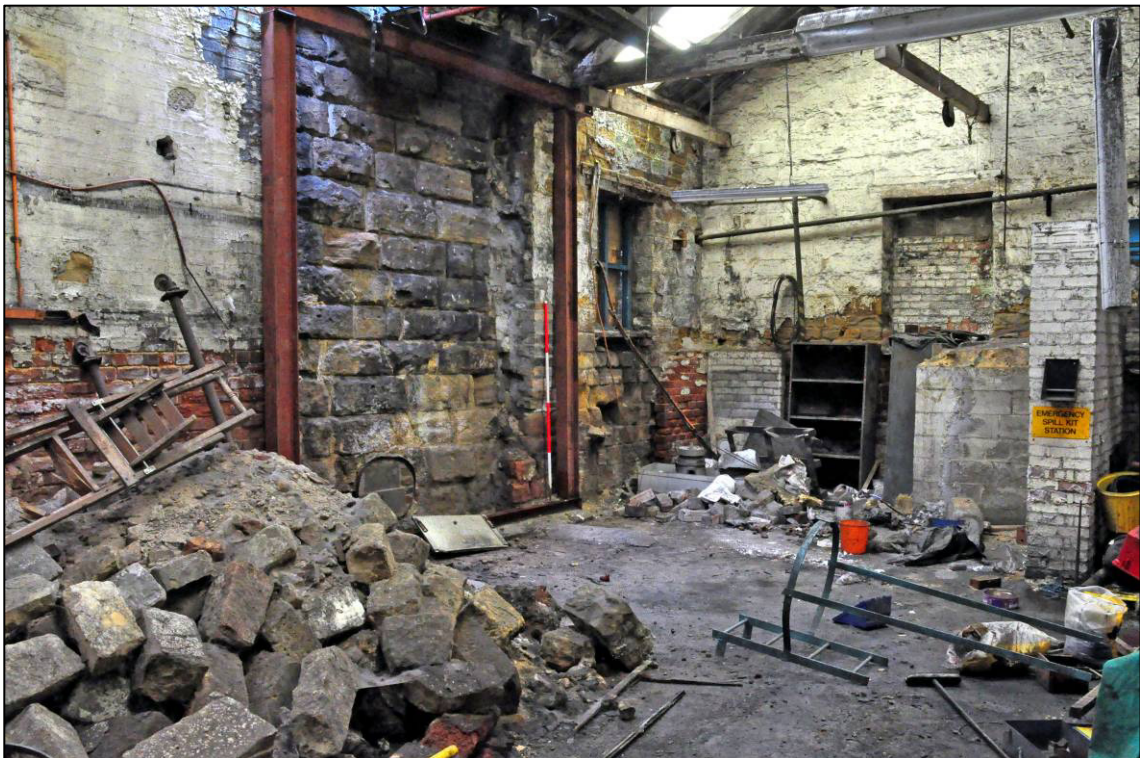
Boiler house, west and north walls, showing base of chimney, looking NW (photo 11828).
